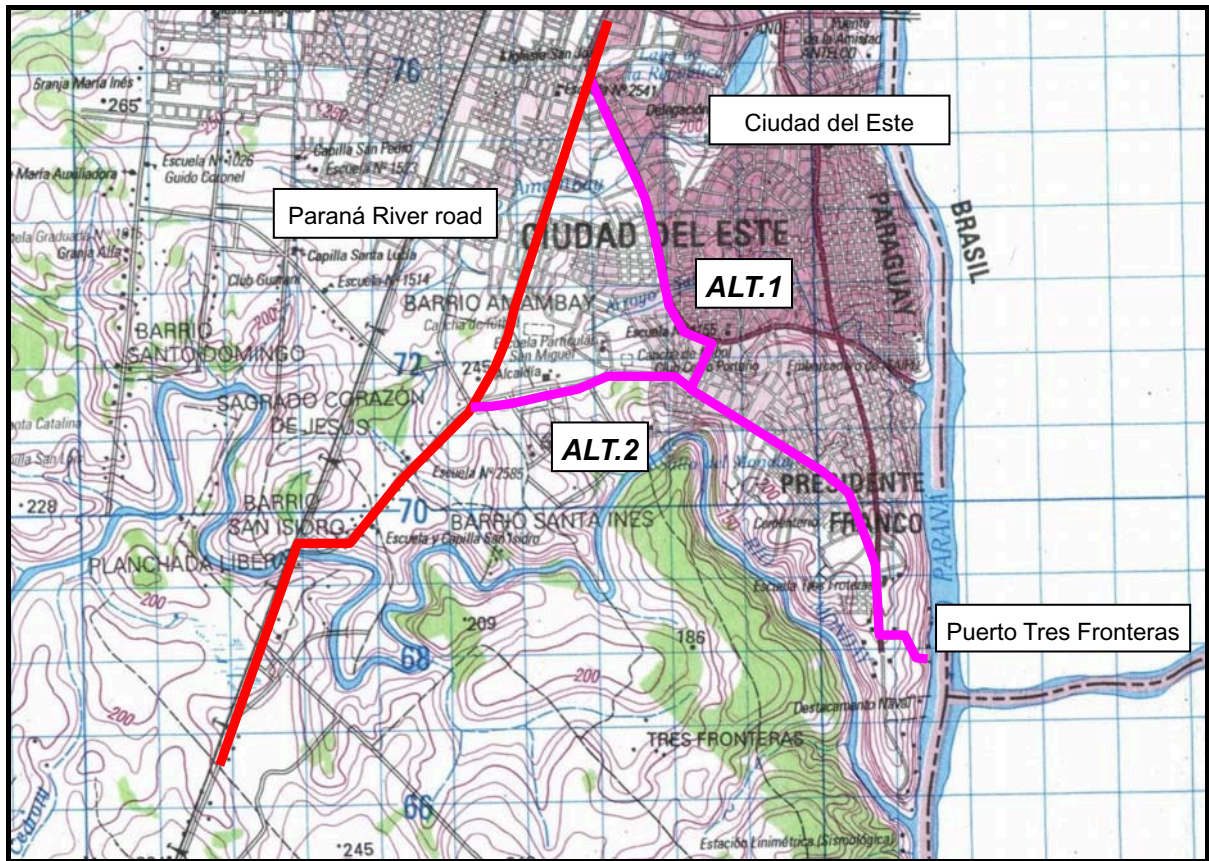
Puerto Tres Fronteras access road alternative routes
